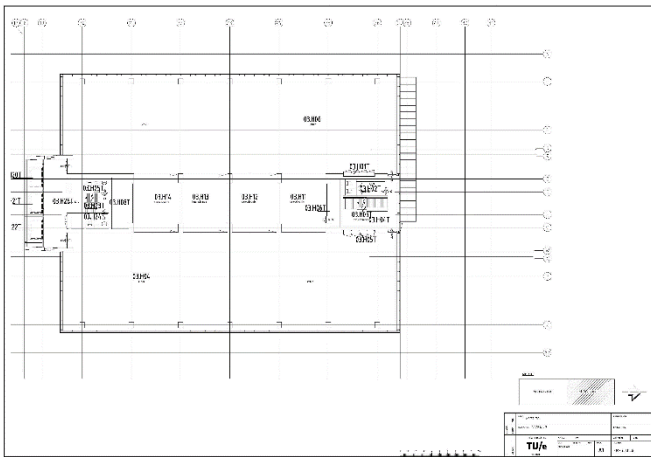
Floorplan of 3rd and 4th floor of the Vertigo.
